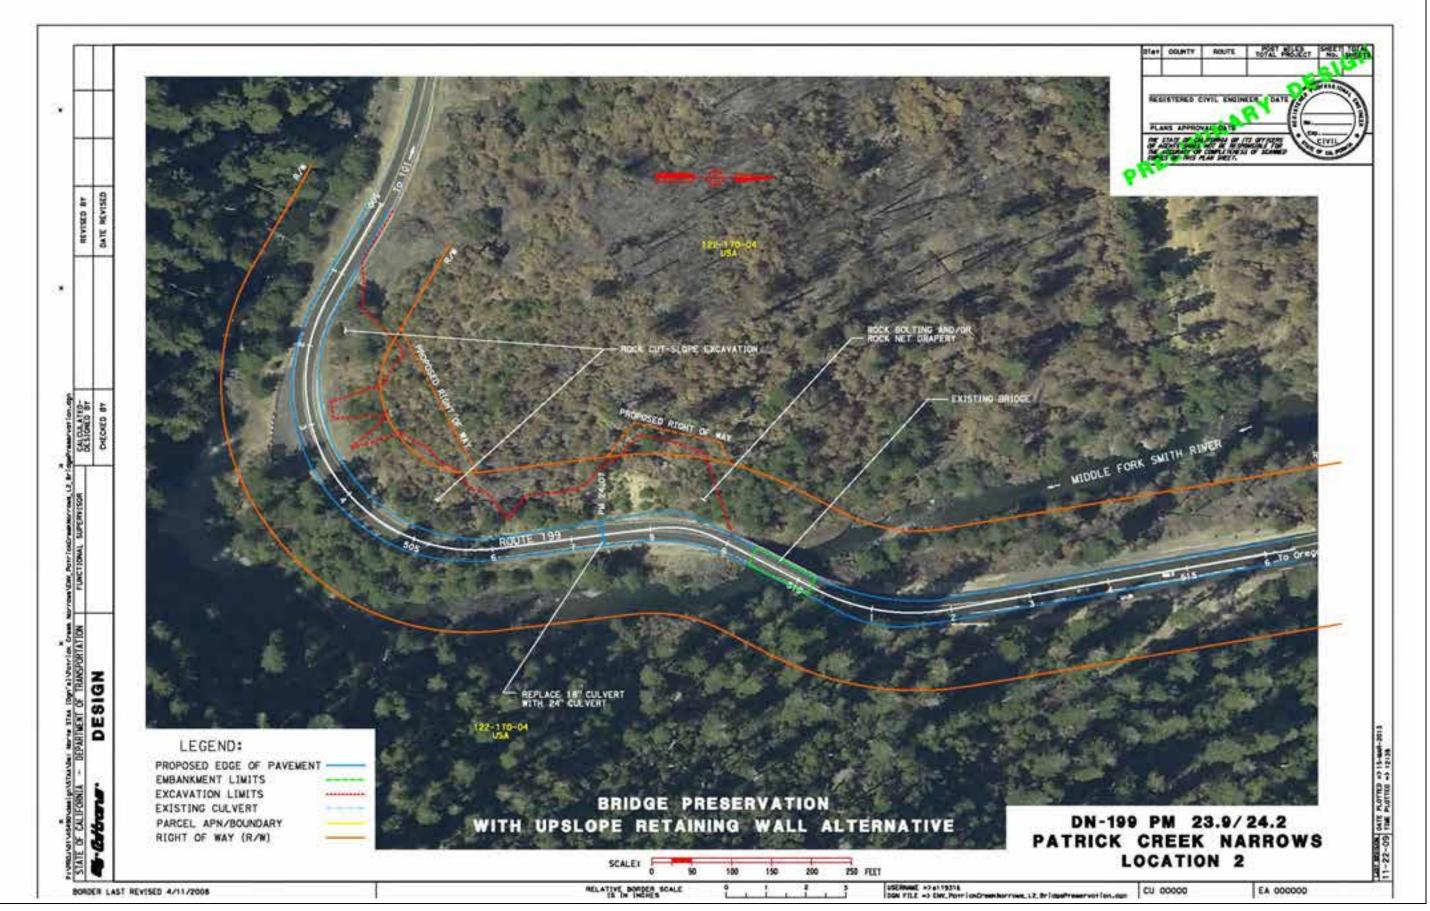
Patrick Creek Narrows Location 2: Bridge Preservation
